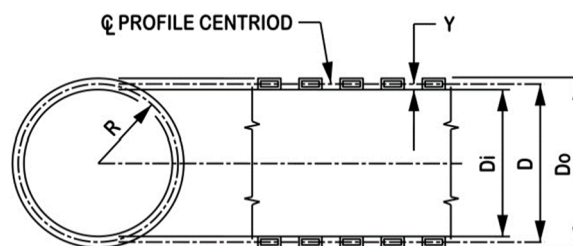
Schematic for Thermoplastic Pipe Terms
